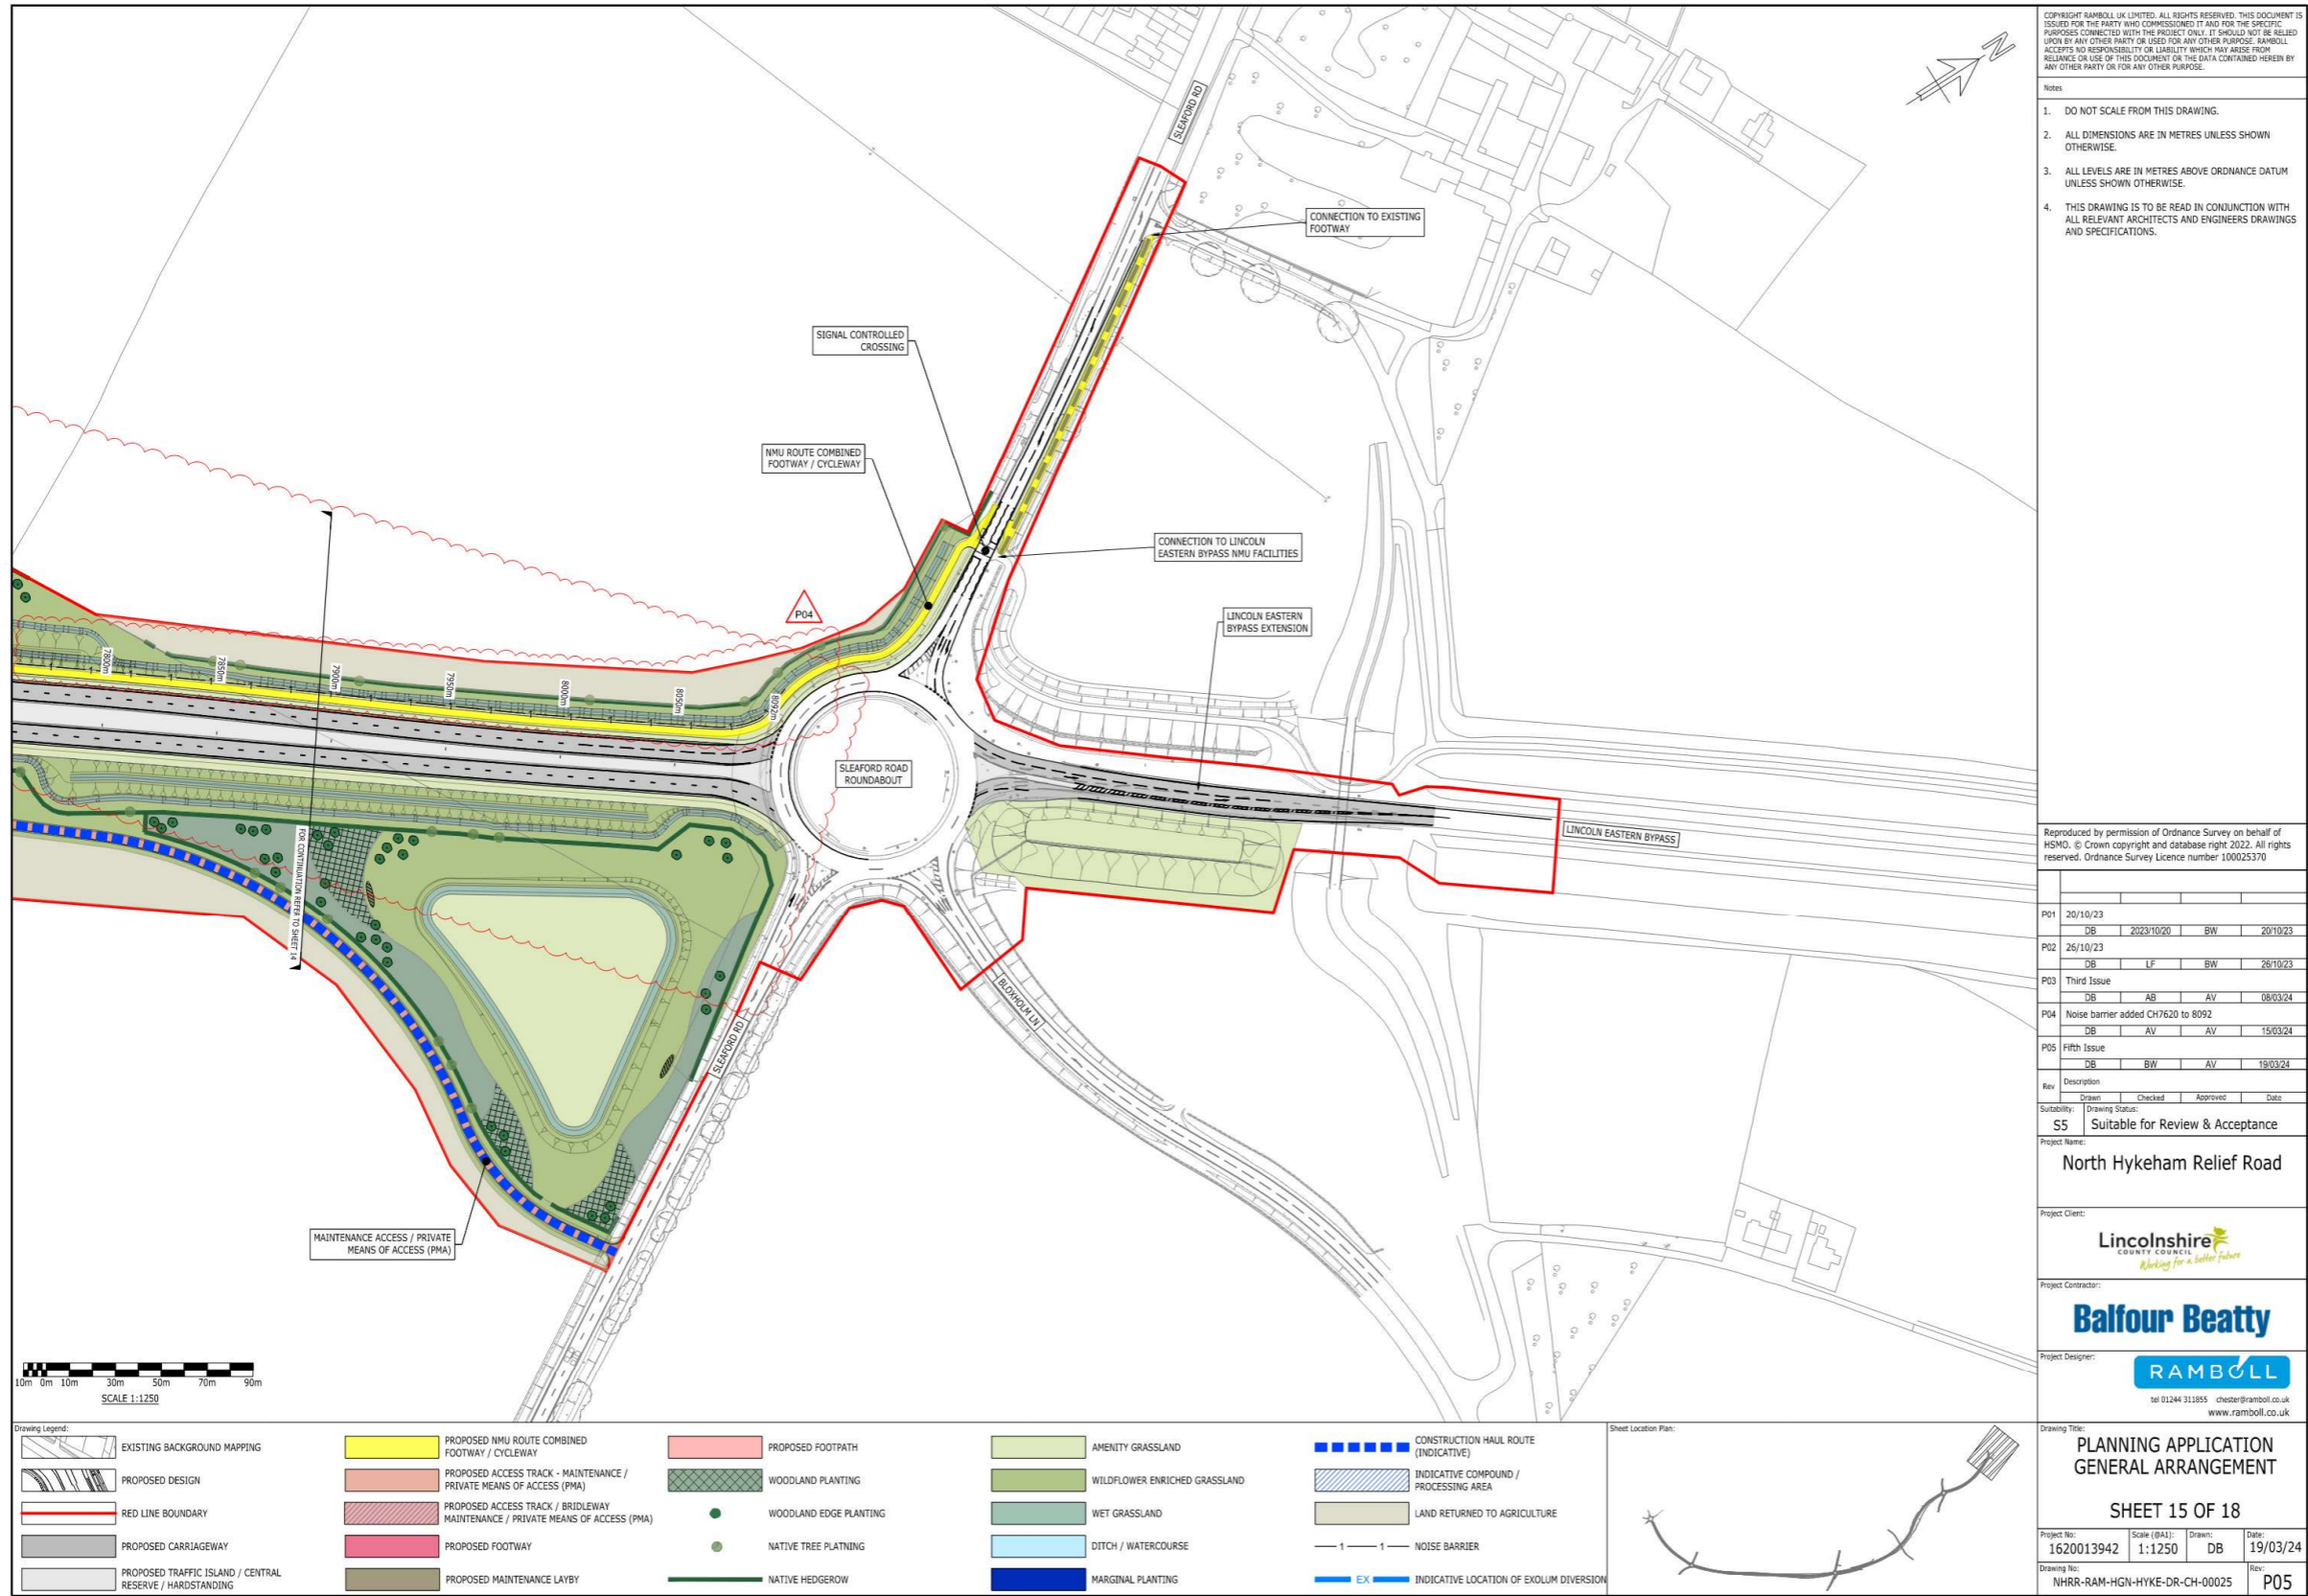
Subsequent Additional Acoustic Barriers: Grantham Road junction and the Sleaford Road junction, Part 3 (Planning Application General Arrangements: Sheet 15 of 18)
